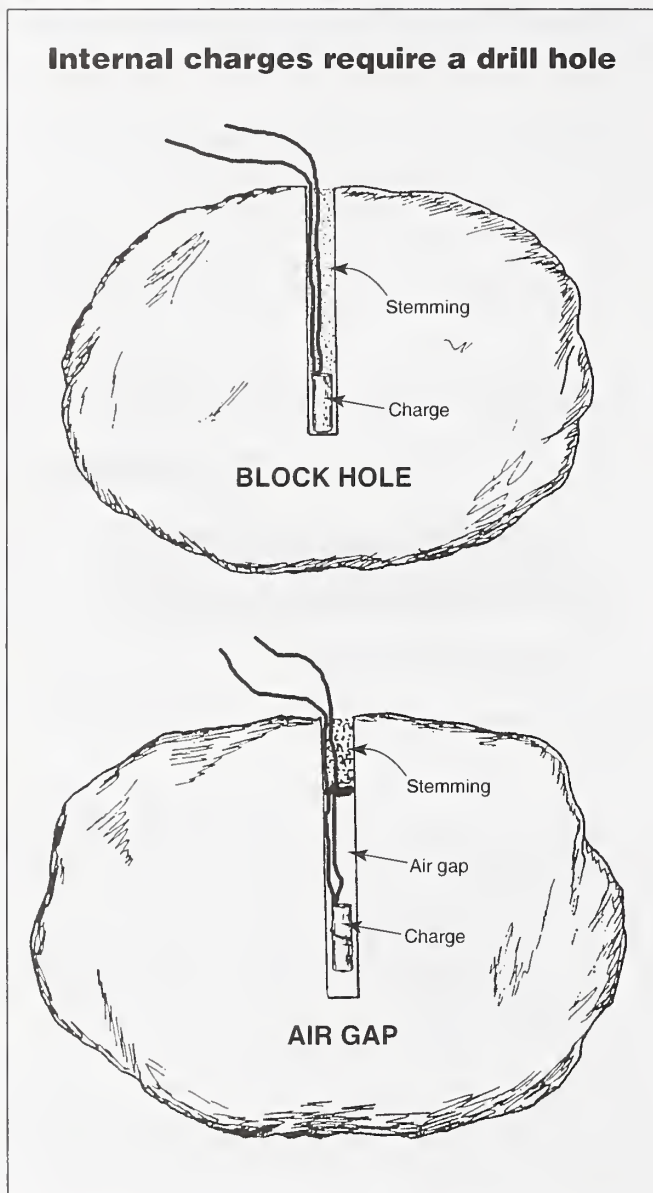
Internal boulder-breaking charges require a drilled hole.
